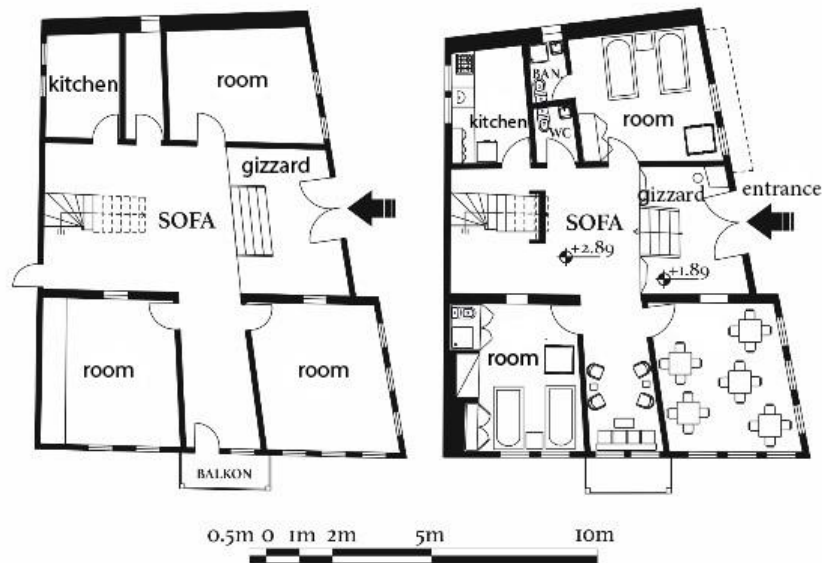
First and second floor plans / Çakırlar House (measured drawings)
